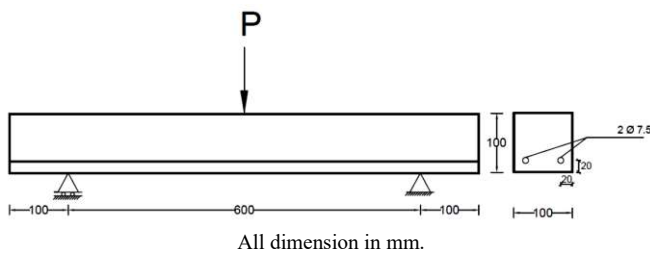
The details and a cross-section of the reinforced concrete beam.
